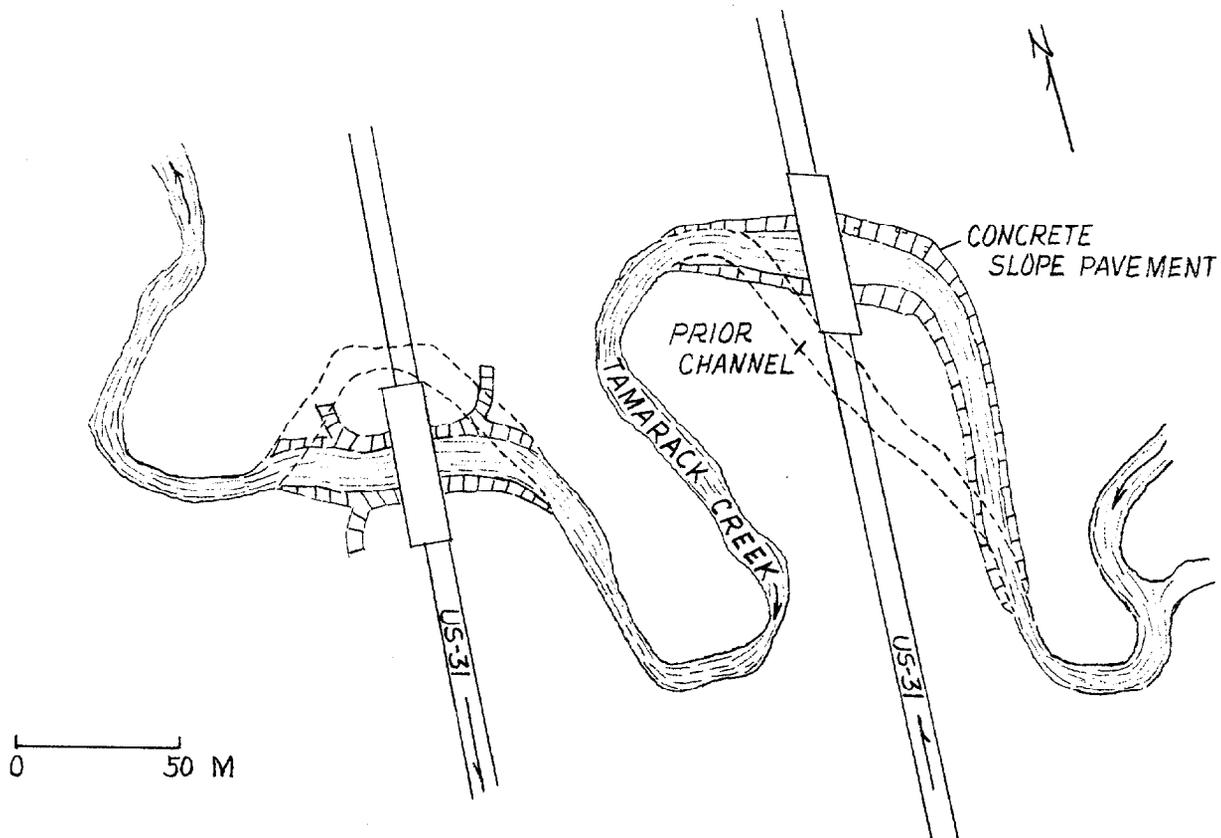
Plan sketch of channel relocation, Tamarack Creek.
